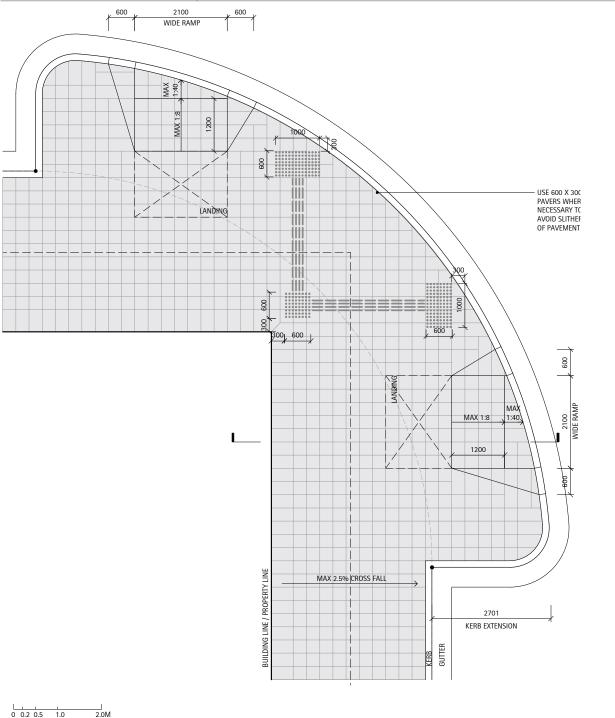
Streets Corner Plan: Kerb Extensions 2100 Ramp
